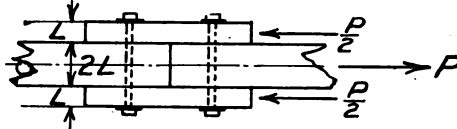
SPLICE IN TENSION CHORD OF TRUSS.
